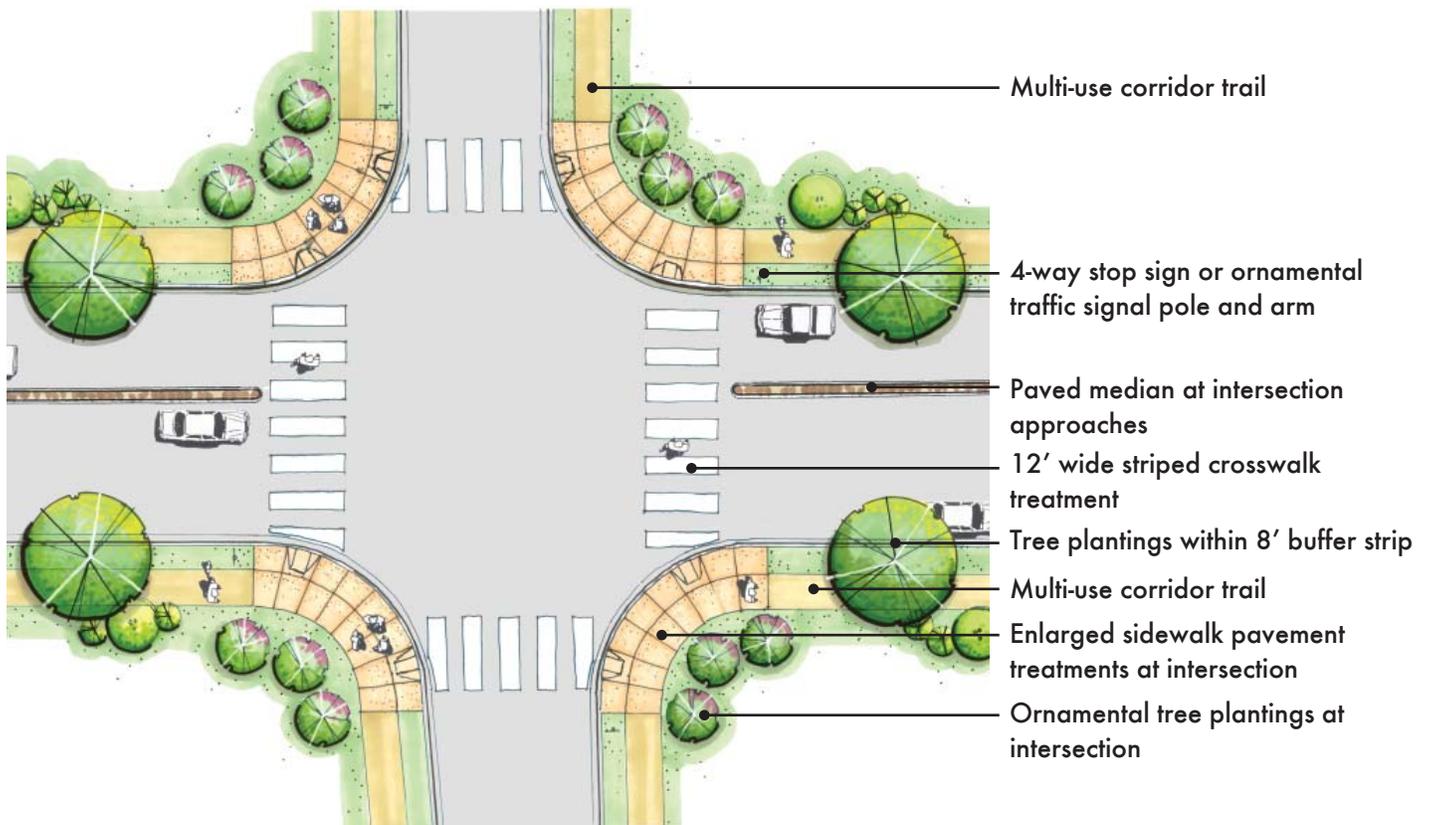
Typical plan illustrated intersection treatments at secondary intersections. Secondary intersections provide additional pedestrian at all corners while utilizing a minimal crosswalk treatment.
